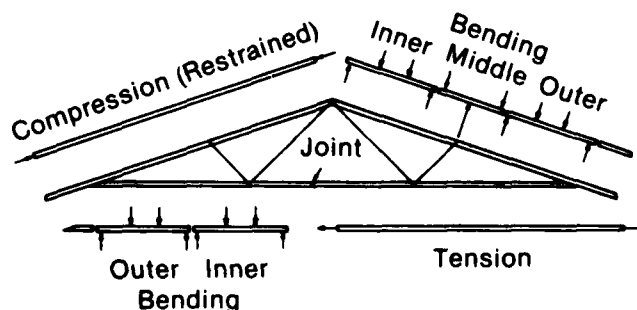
Schematic of test specimen types for truss chord lumber. Arrows indicate loading modes. (M152111)
